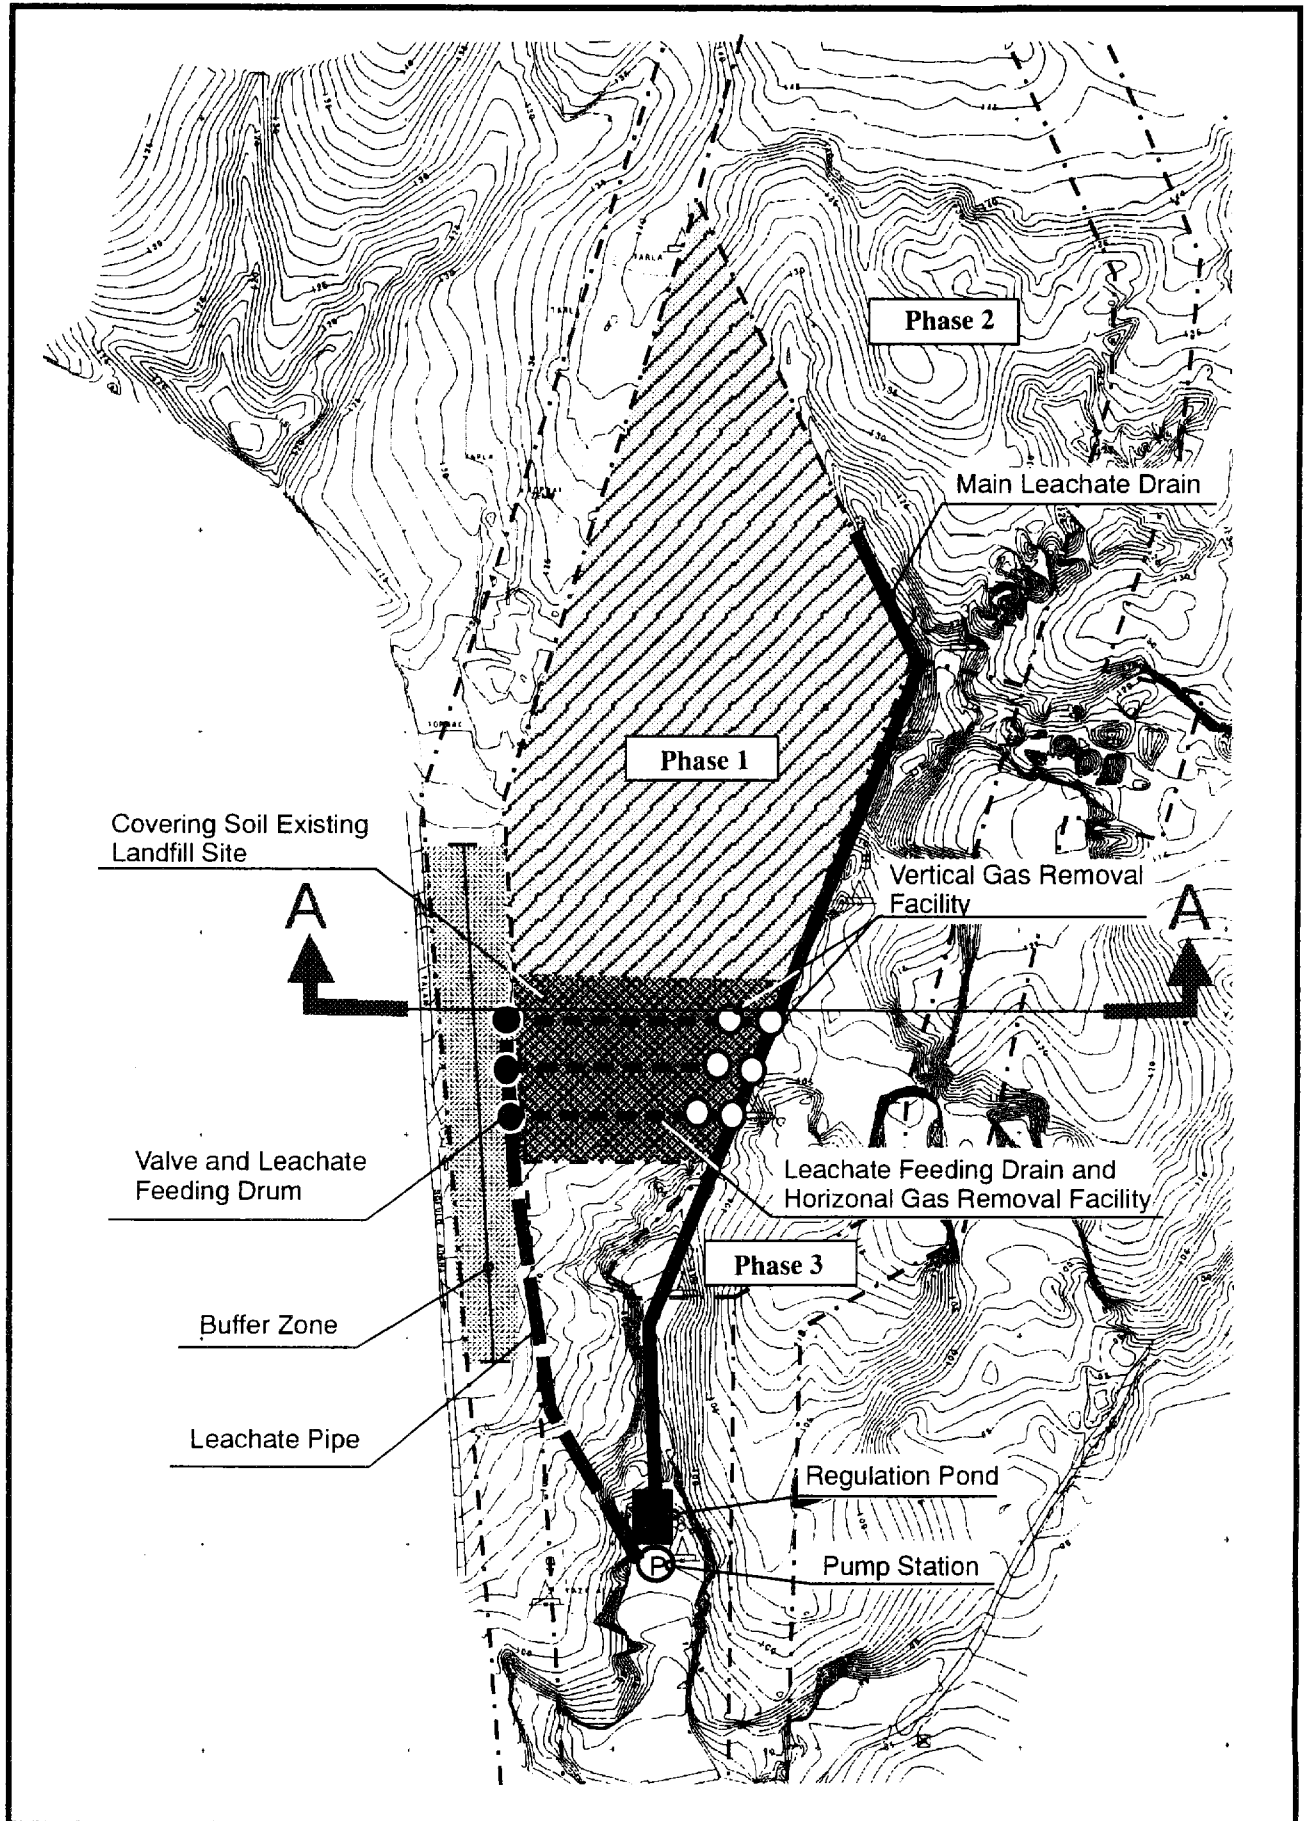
Overall Plan of the Experiment on the Improvement of Sofulu Disposal Site
